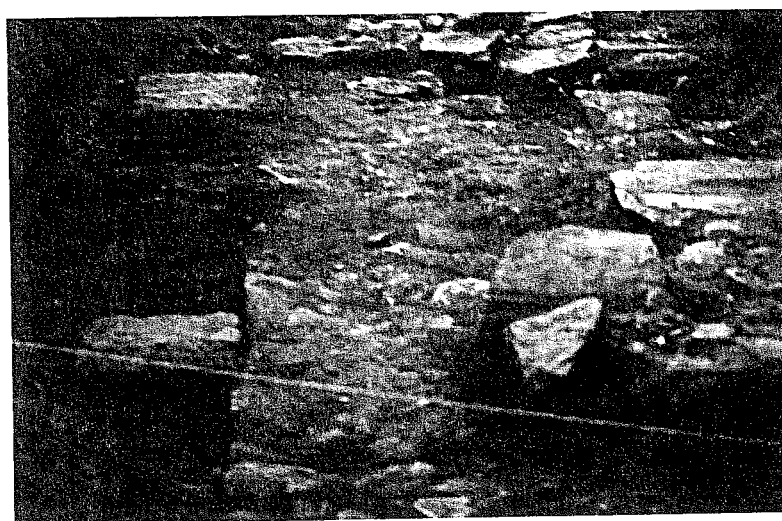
Auburn, hard fired brick platforms, mid- 19<sup>th</sup> century, for floor joists?
